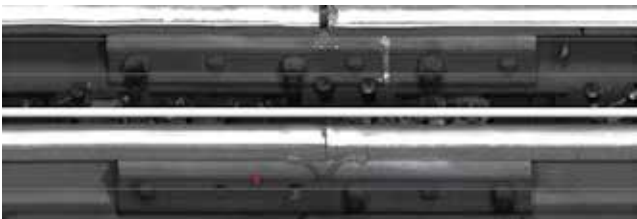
Rail surface & components Inspection – rail batter & missing bolts [11]
